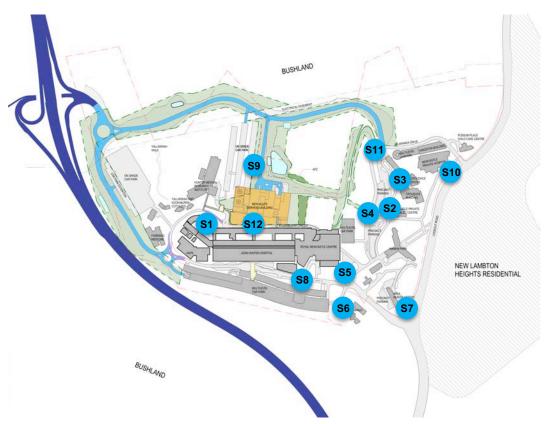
Site Plan, Proposed Works and short-term noise monitoring locations
